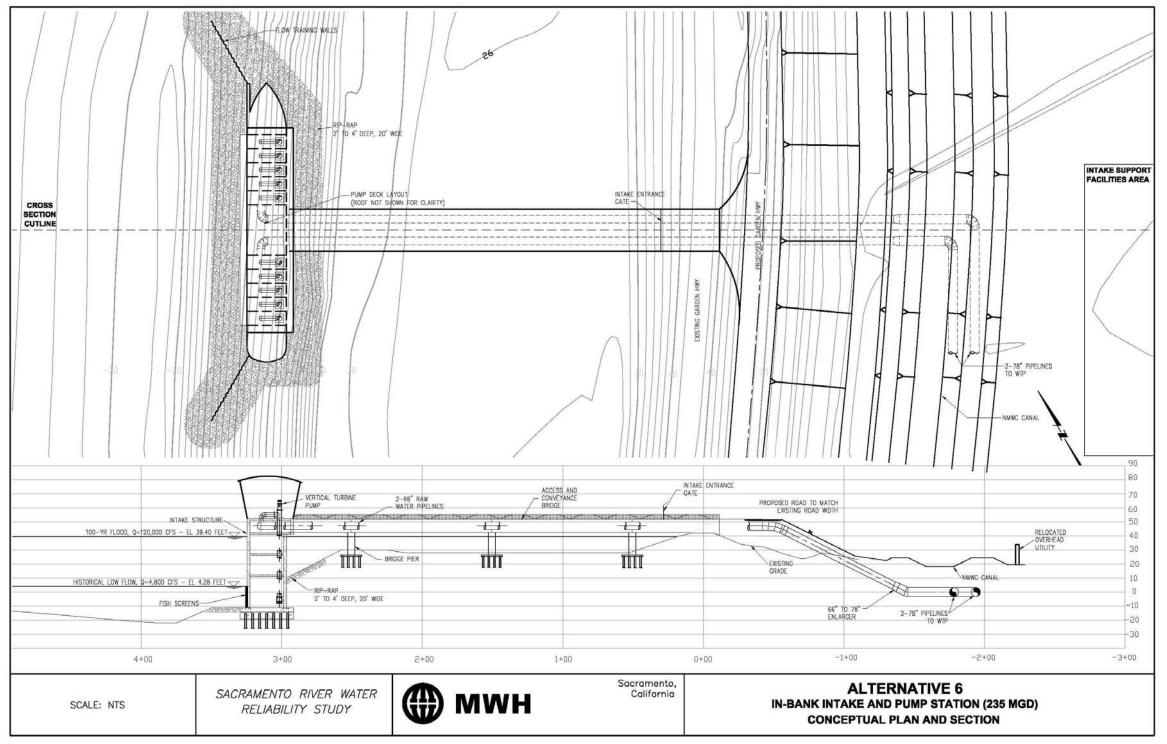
Alternative 6 - In-Bank Intake Structure and Pump Station with Vertical Fish Screens
